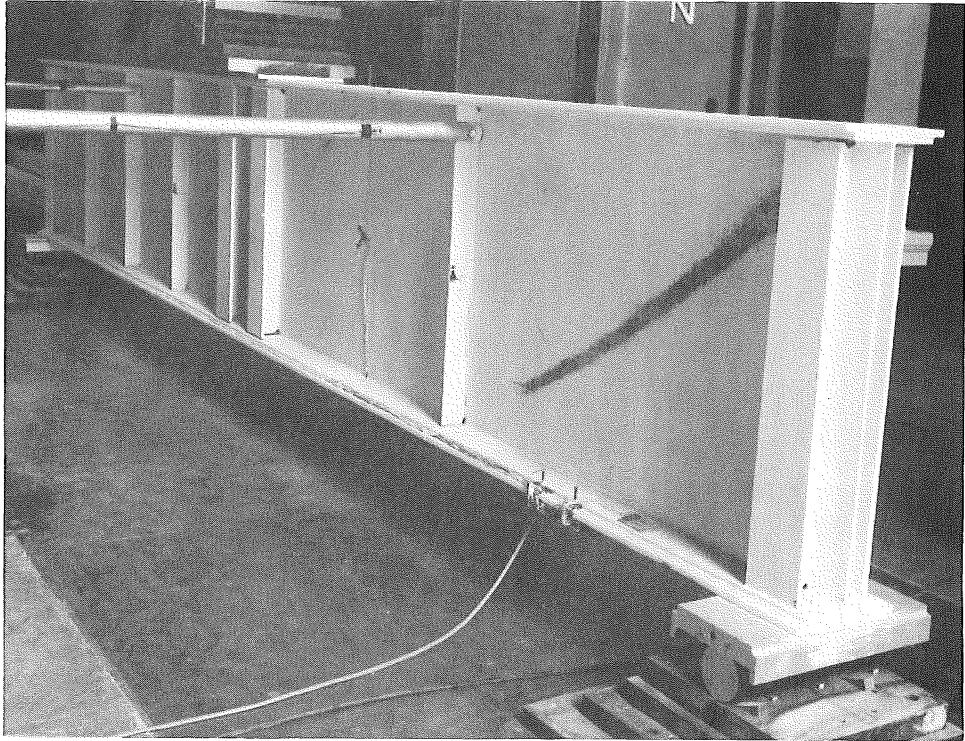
Premature Failure in End Panel, Girder E4
